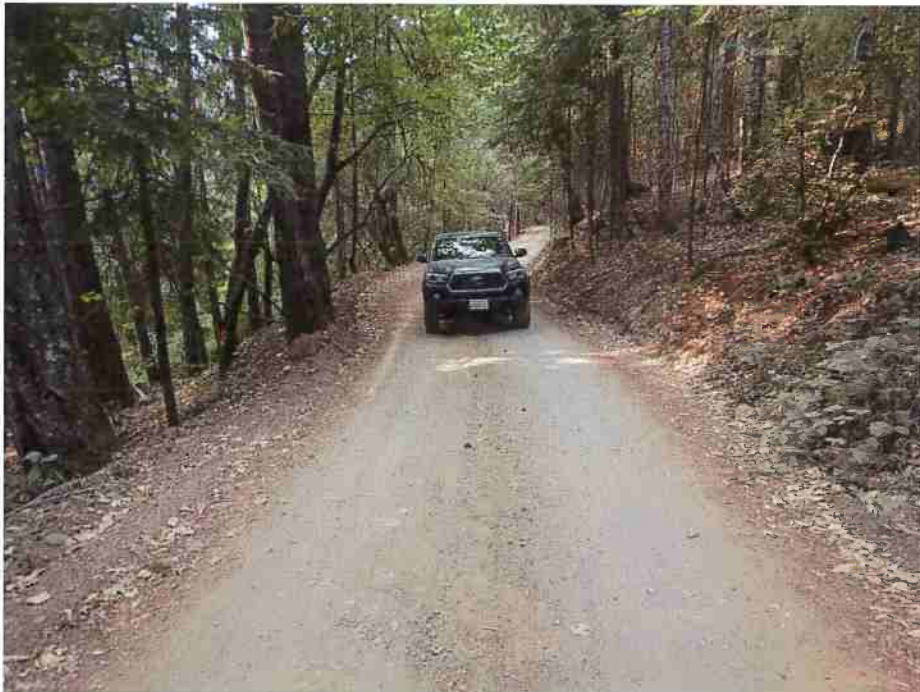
RP 7. Vehicle traveling north, photo taken facing south.
